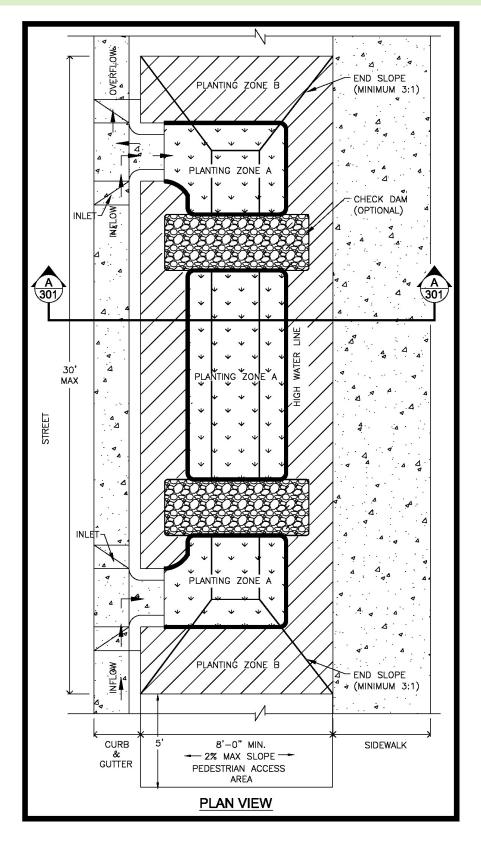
Green Streets Swale Plan View (source: Portland, 2011)
